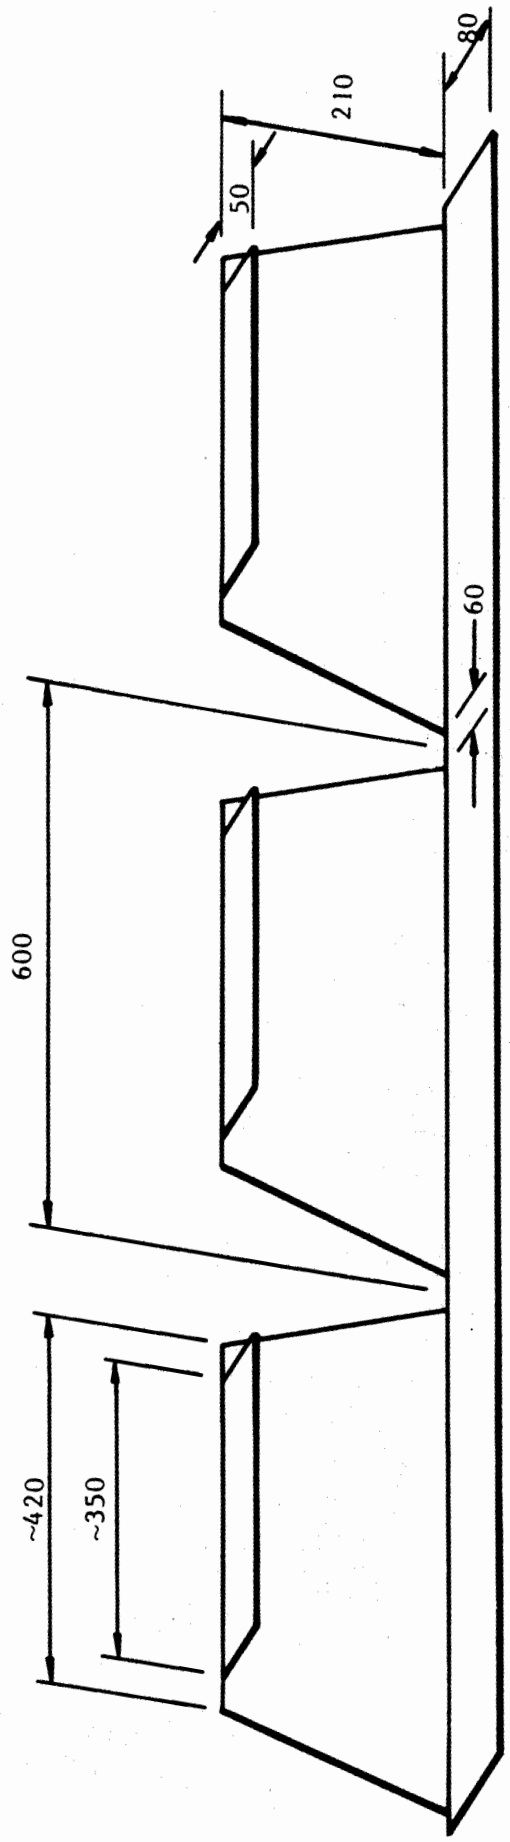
DIMENSIONAL DETAILS OF PMF 210 mm DEEP CLOSURE FLASHING - TEST NO. WFRC 56867 (R4/49)
